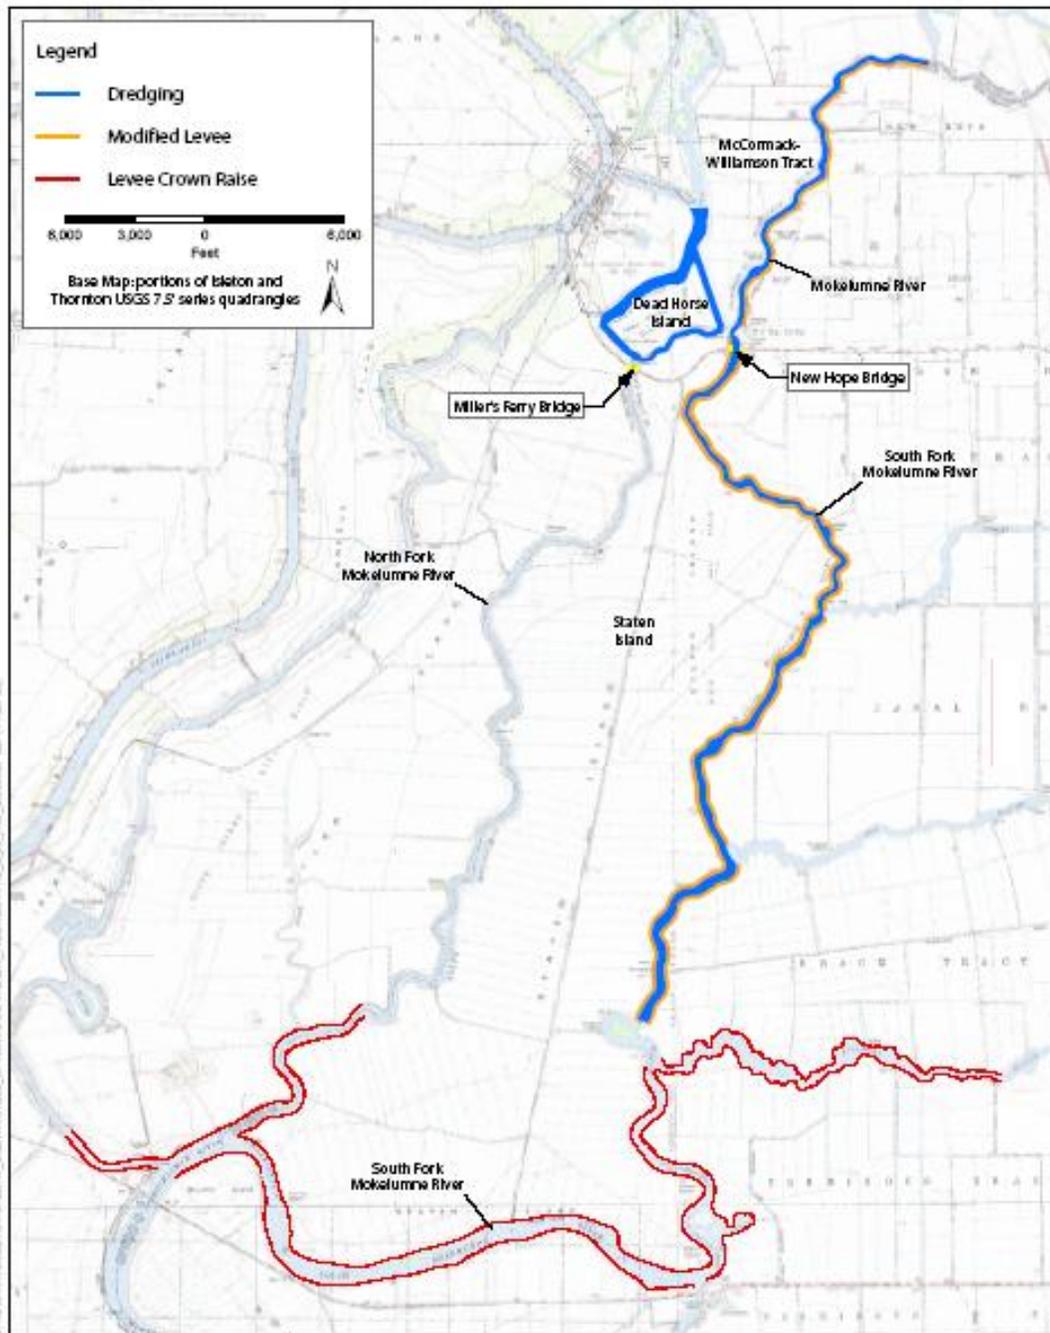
Alternative 2-D: Dredging and Levee Modification Plan
